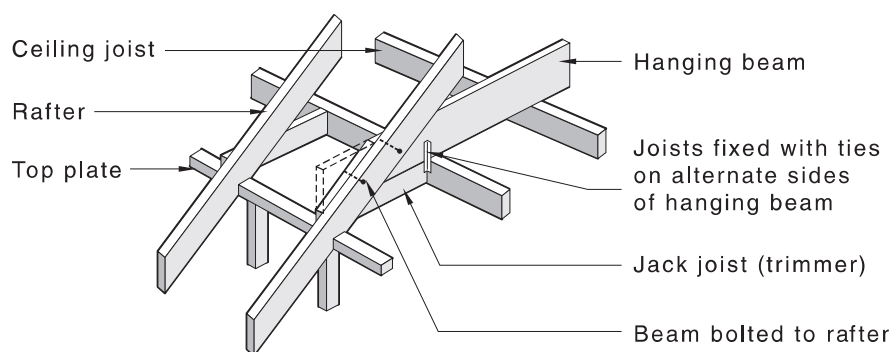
Support of hanging beam with jack ceiling joist (trimmer)
